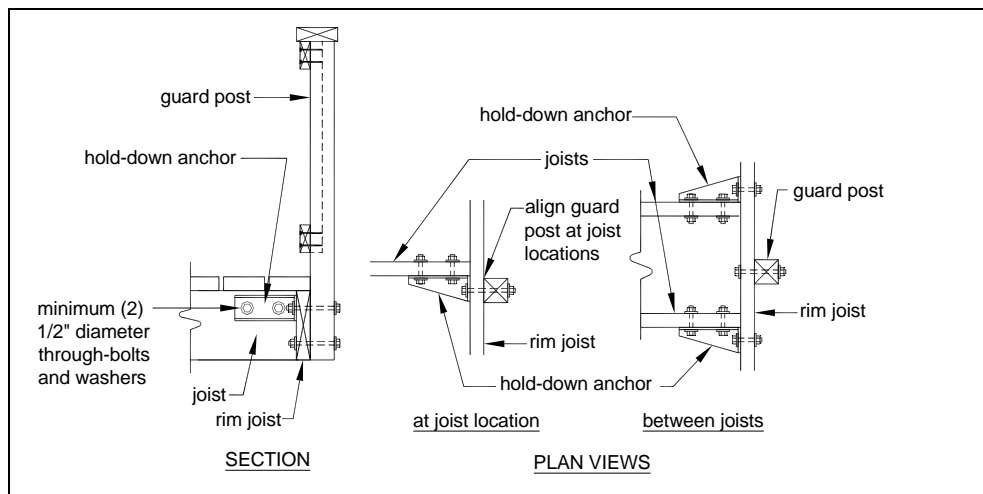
GUARD POST TO RIM JOIST DETAIL, OPTION 2
